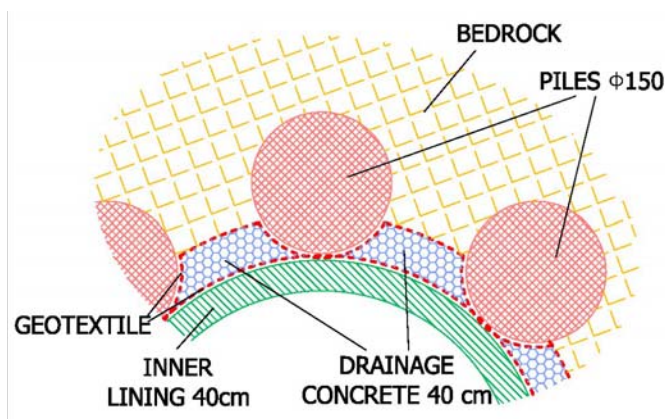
The detail of embedded draining concrete into the primary and secondary coating of the RC well.
